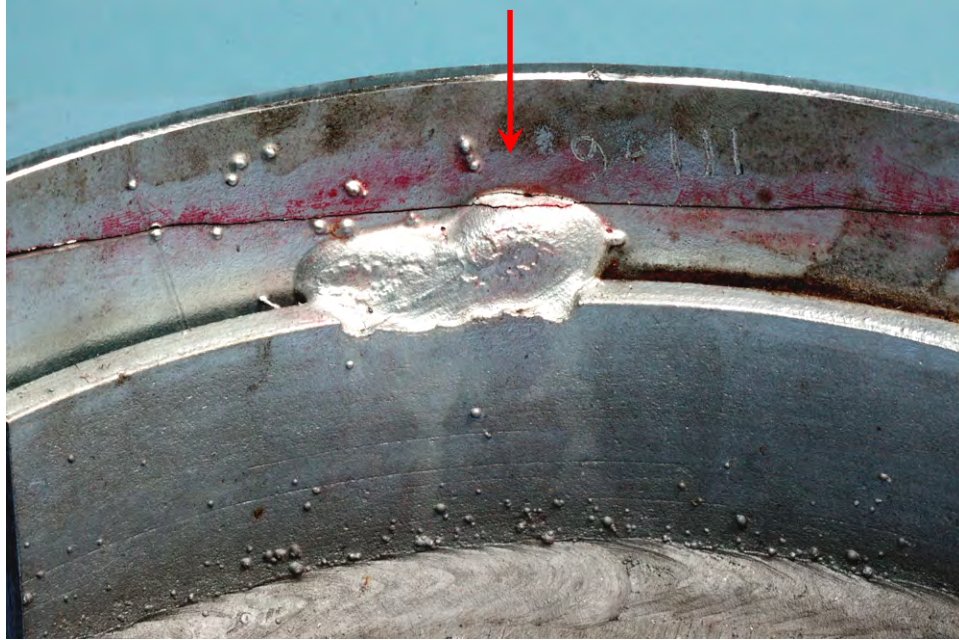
Fatigue cracking in arm of specimen III-6 from tack weld between the backing ring and the tube wall
